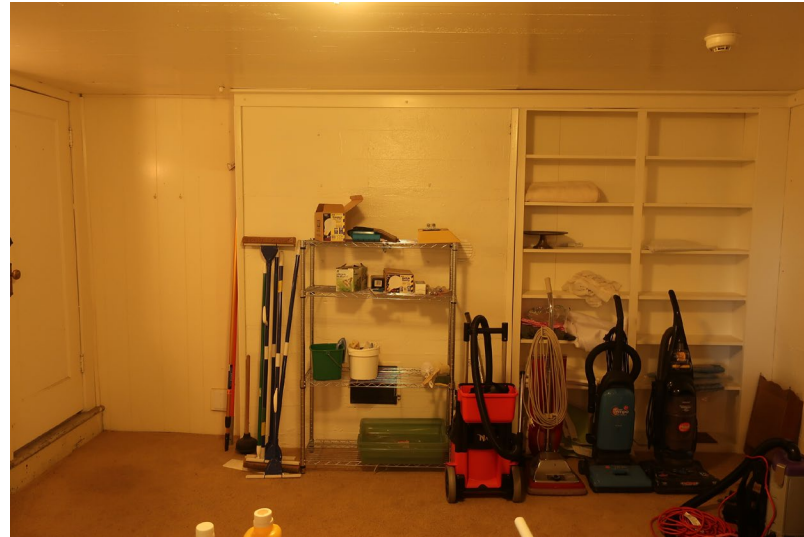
View looking north. The concrete chimney base is at center, and building shelving at right.
